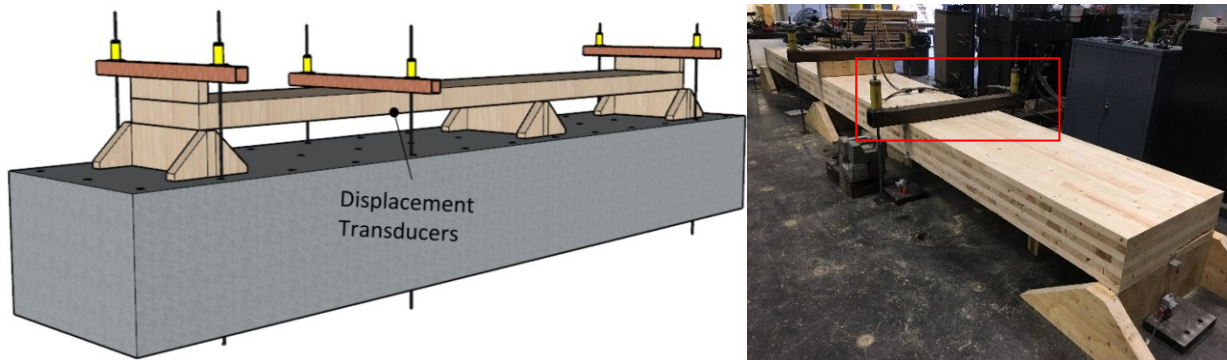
Static deflection test set-up using hydraulic cylinders
